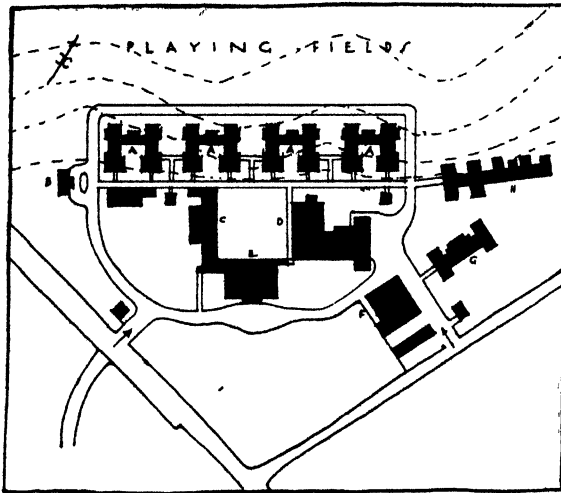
LAYOUT PLAN OF THE ROYAL MASONIC SCHOOL FOR BOYS, BUSHEY
